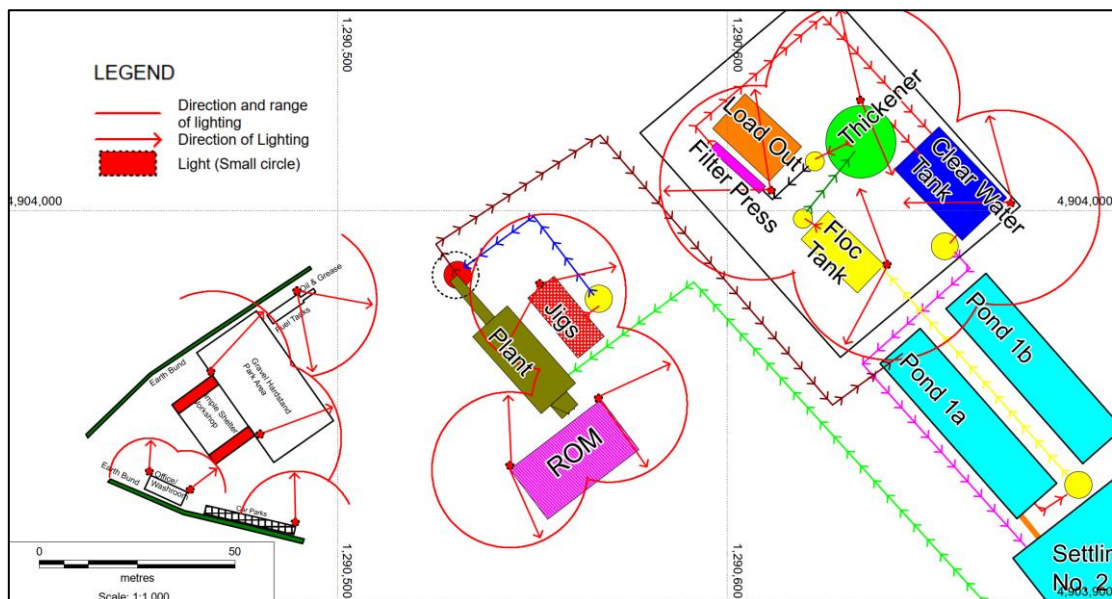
Concept lighting plan for infrastructure area (Source: WGML)
